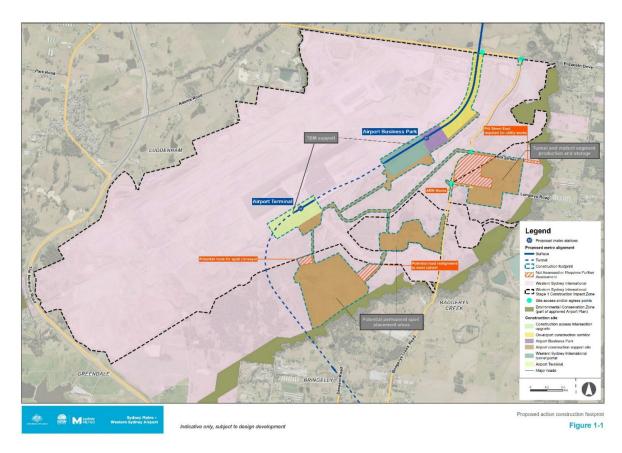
Sydney Metro - WSA Rail Construction Impact Zone (RCIZ)
